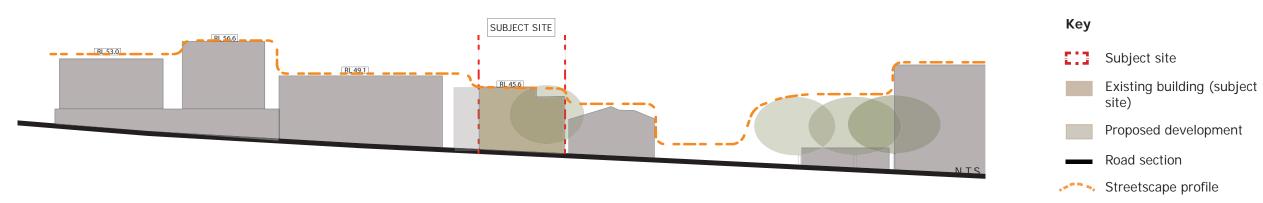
Proposed streetscape profile (northern side of New South Head Road).
